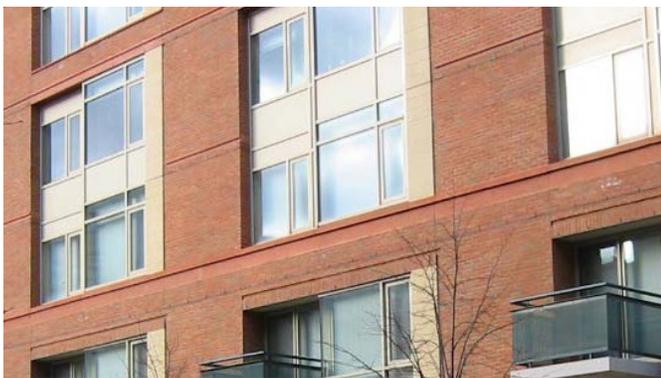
This project inserts a curtain wall system within a punched opening. The red brick wall turns to reveal the wall's thickness, and the curtain wall is placed at varying depths within the apparent thickness of the brick wall opening.
